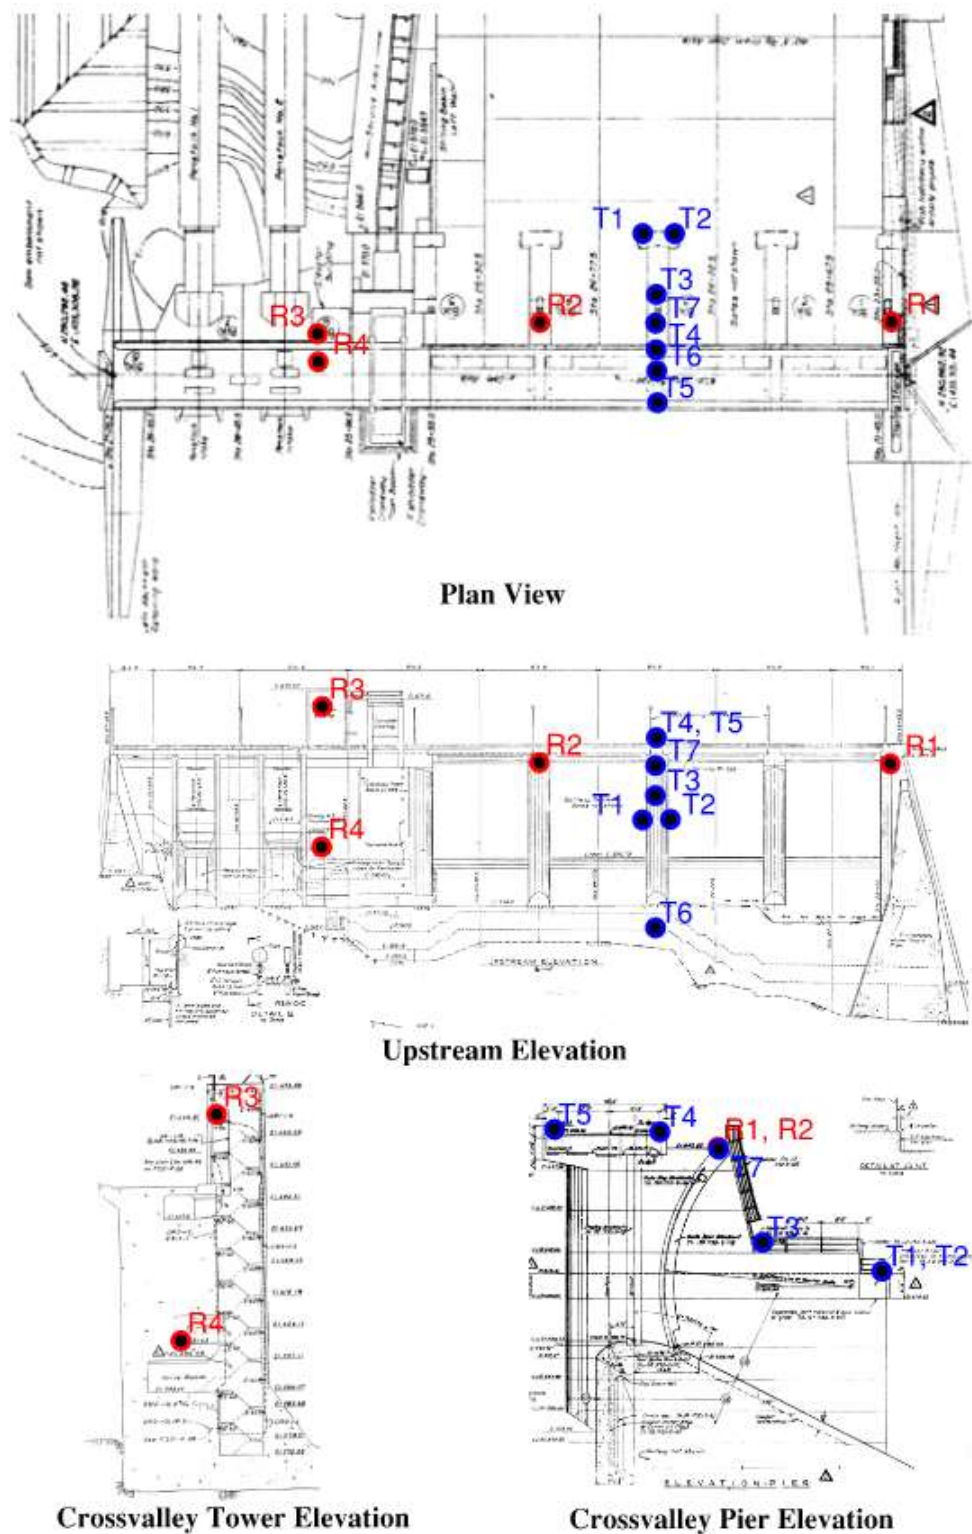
Test Setup 3 (TS-3) reference instruments (R1 through R4 in red) and temporary (T1 through T7 in blue) instrument locations. Top: plan view; middle: downstream elevation; bottom: cross-valley elevations. Adapted from USACE, 1964.
